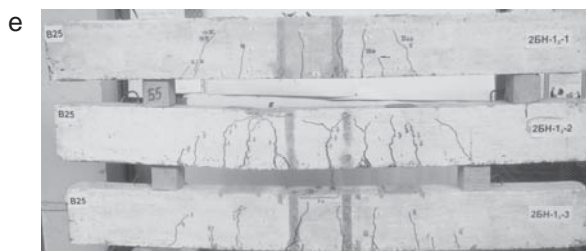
The nature and location of the cracks in the tested beams: d, e, f – Concrete C20/25(B25)
